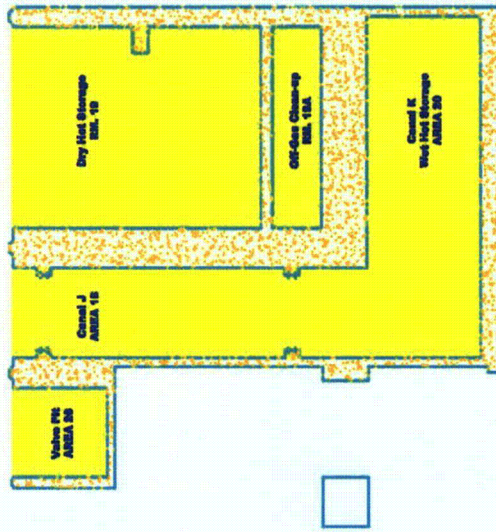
Hot Laboratory Building 0'-0" Elevation
